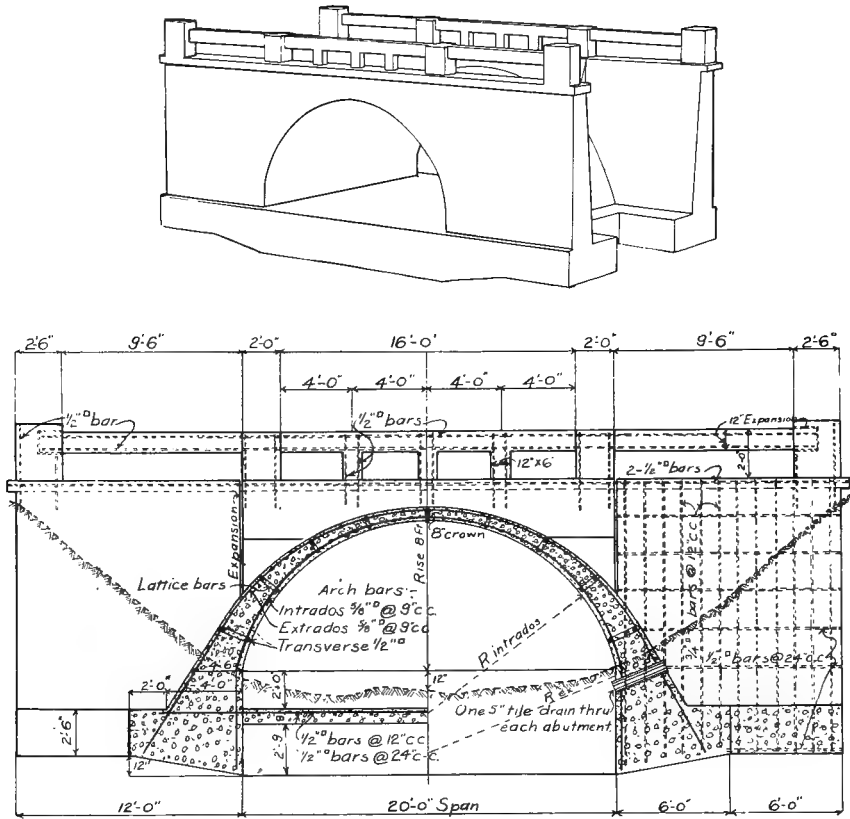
gives the standard design for 20-ft. span, 8-ft. rise, reinforced concrete arch culvert used by the Iowa Highway Commission, T. H. McDonald, State Highway Engineer. The wing walls in this design are shown parallel to the axis of the roadway and are reinforced. This arch is not semi-circular as it is only given an 8-ft. rise in 20-ft. span.
